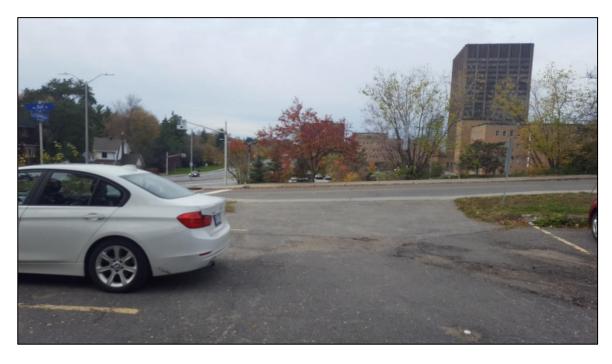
View of retaining wall at east property boundary (October 27, 2016)
